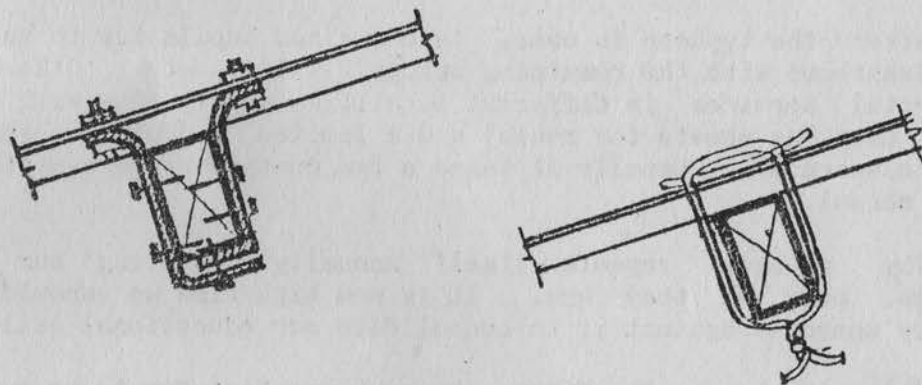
Linkage from roofing materials with roof frames to restrict damages by typhoons.
